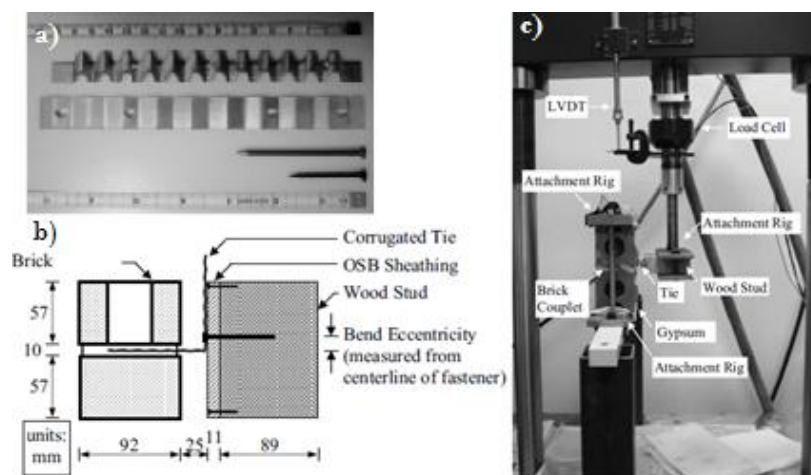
Details of tie connections for shear test: (a) tie and fasteners types, (b) scheme of specimen and (c) test setup [42]
